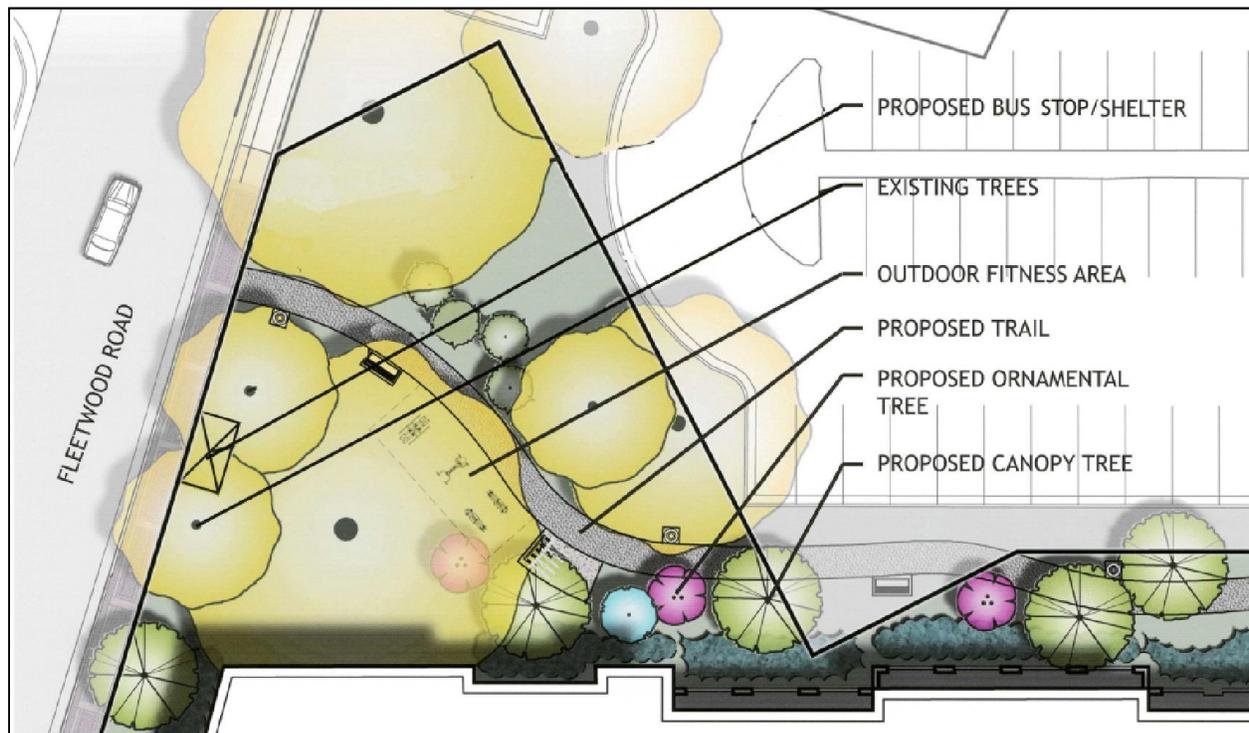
The site's open space fronting Fleetwood Road at the western trailhead for the resurfaced asphalt trail (Source: Bowman Consulting and Niles Bolton Associates, June 1, 2014)
